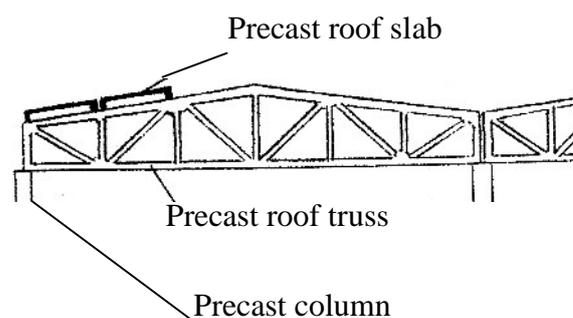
Steel-concrete composite precast and prestressed roof trusses accommodating roof precast slabs and supported by precast columns
